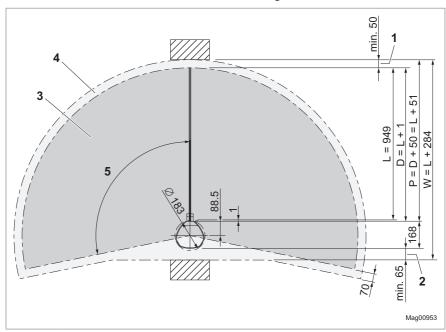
Swivel range mSwing variant with wing ((dimensions in mm) L is a standard dimension
